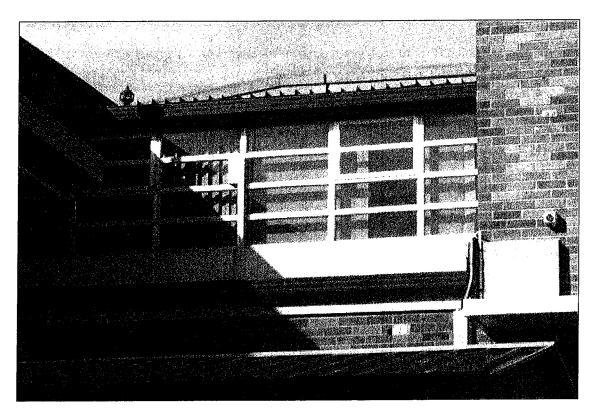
Suspected Asbestos Cement Eave Lining to Building
